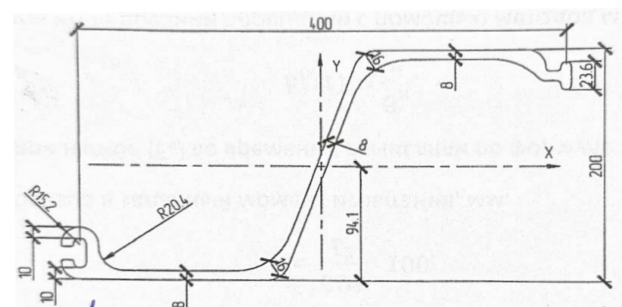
Layout of an individual element of a composite glass-filled sheet pile with a polyurethane matrix, grade ShK-200UM
